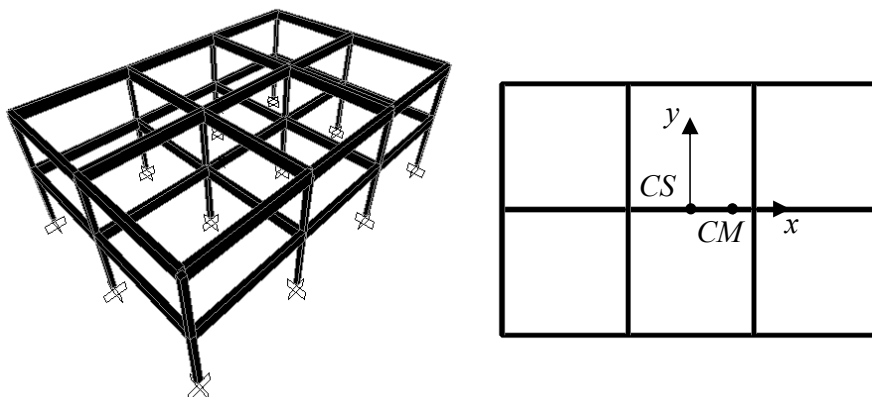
Studied two-storey frame RC structure: 3D view and plan.
